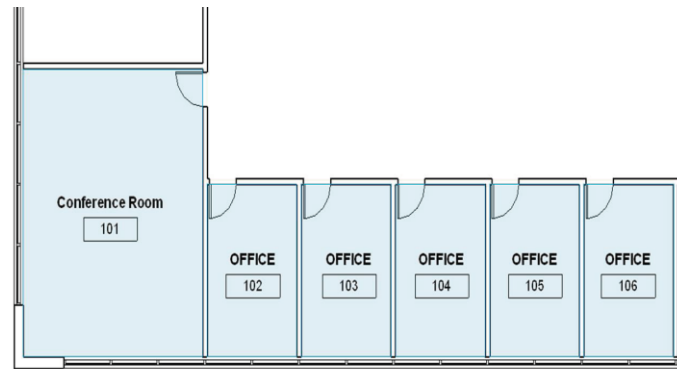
Room-Based Modeling - Floor Plan (IES, 2010)
